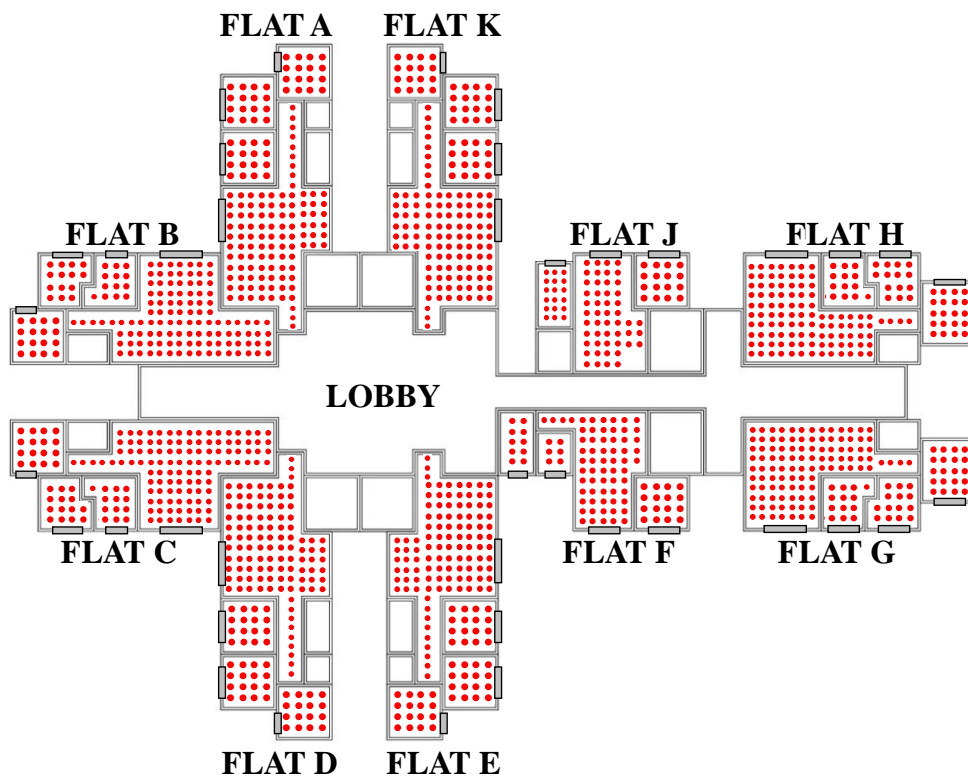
Layout of a selected floor and the arrangement of the measurement points.
